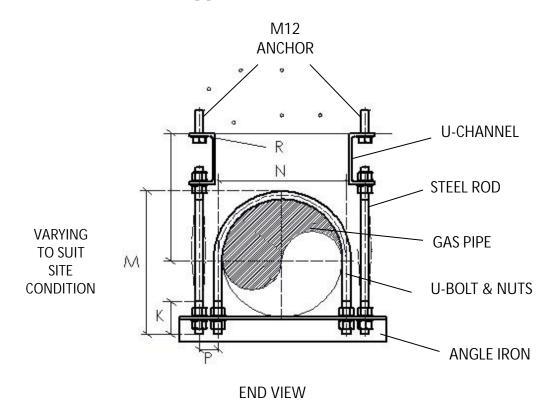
Typical Pipe Support for Horizontal Gas Pipe (E)
